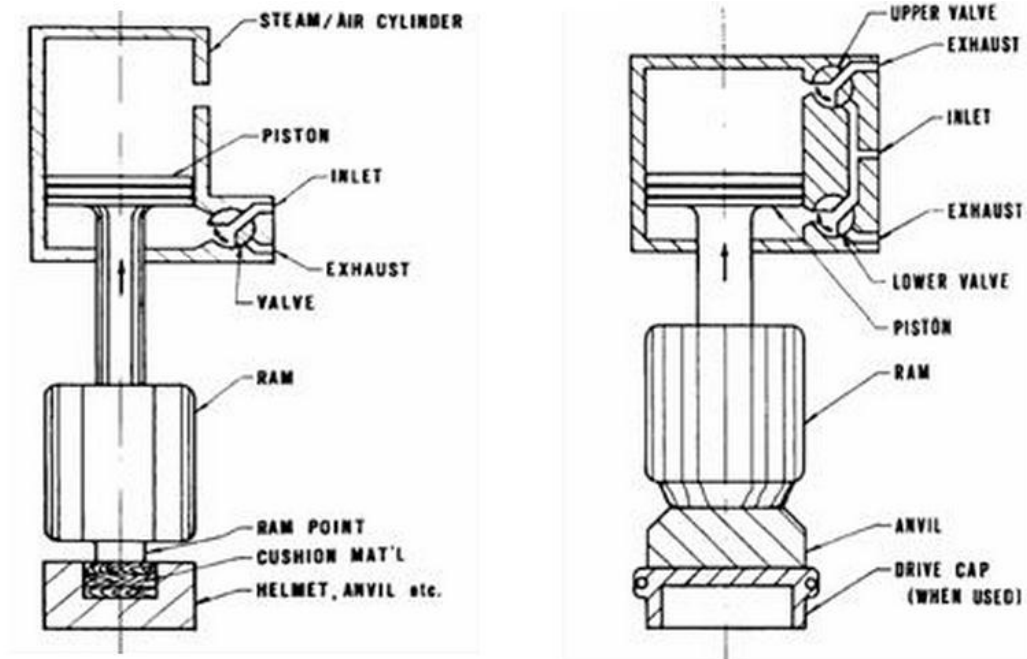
Schematic sketch of single-acting hammer (to the left) and double-acting hammer (to the right) (Foundation Engineering, 2012)
